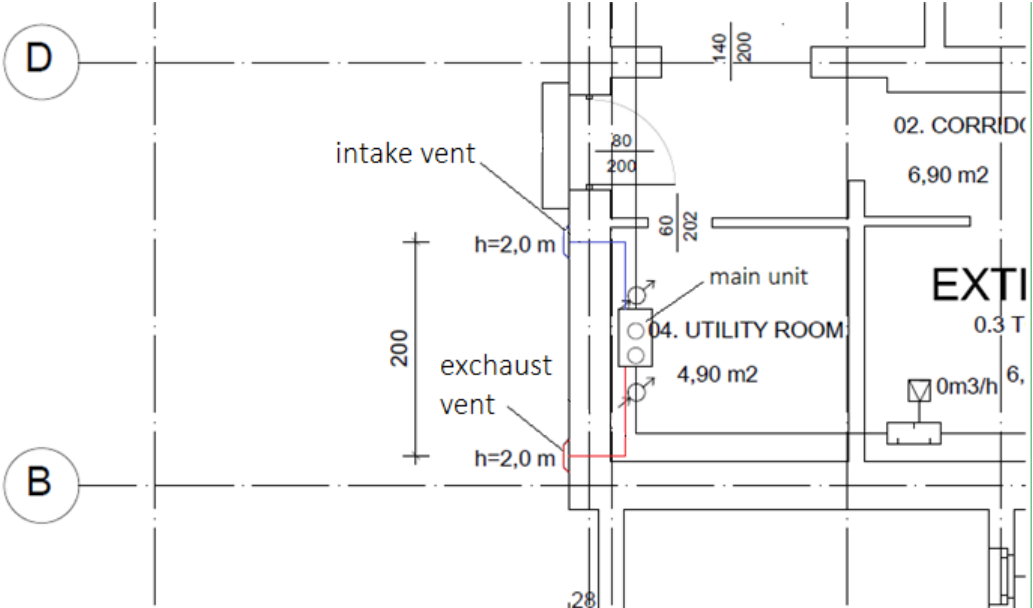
Part of ground floor plan – location of exhaust and intake vent.
